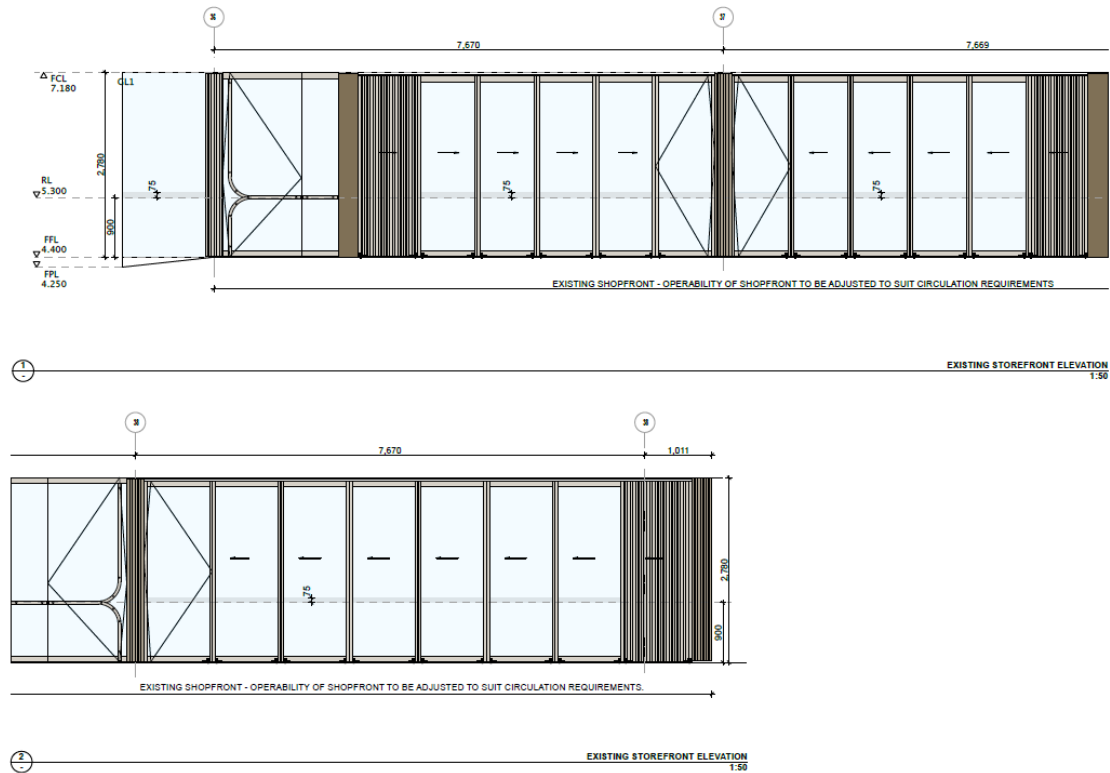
Existing western elevation showing minor adjustments to operability of stacking doors
